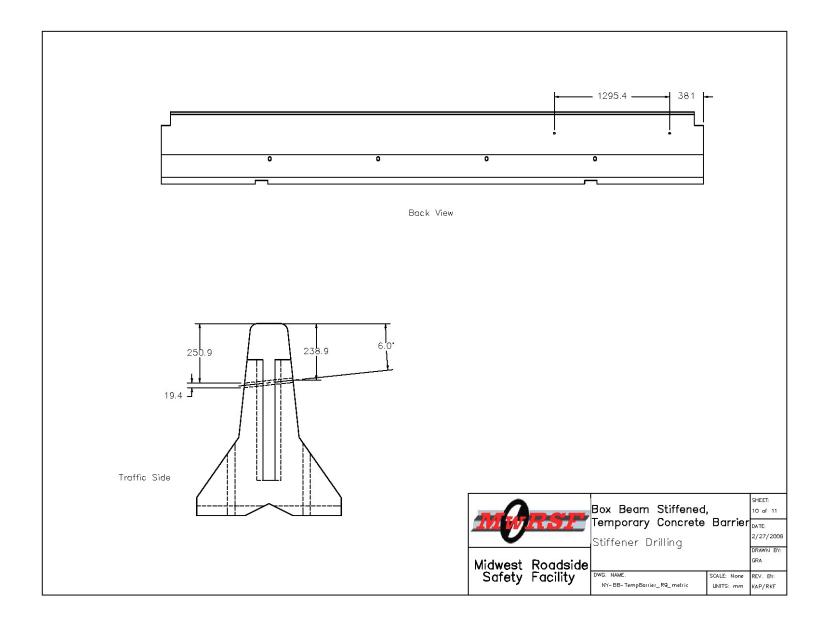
Temporary Concrete Barrier Stiffener Hole Details, Test NYTCB-1
